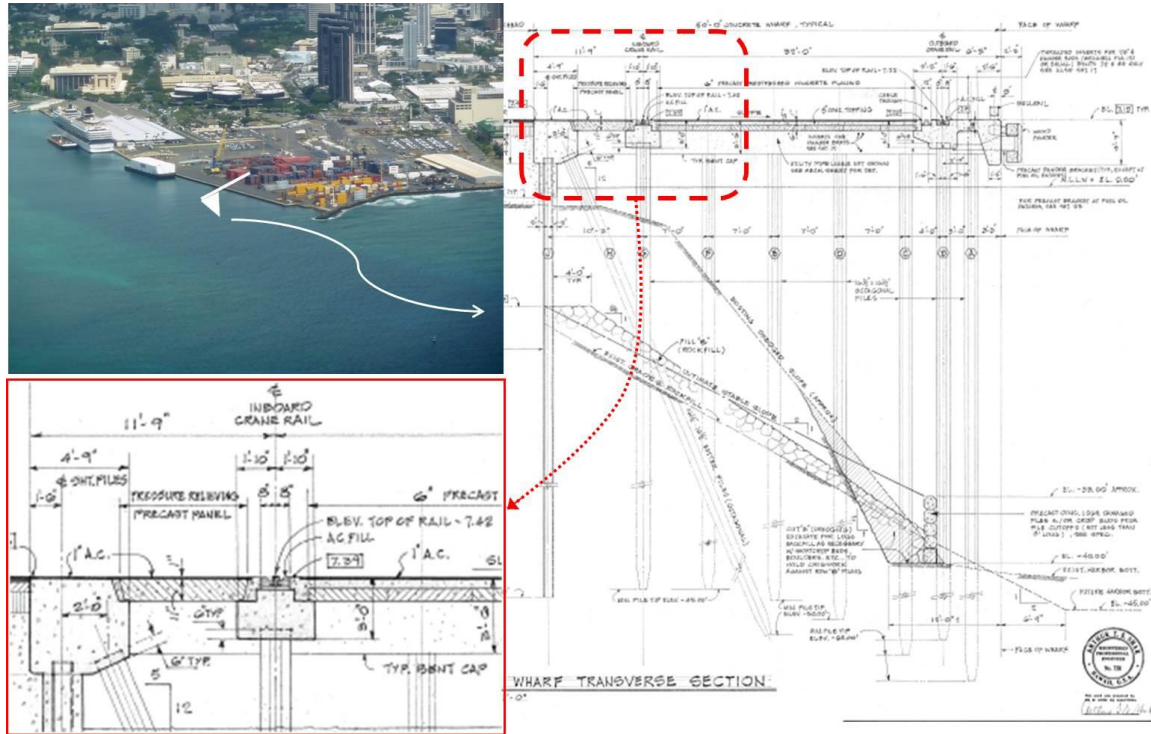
Drawing details of Pier 1 showing “pressure relieving precast panels”
